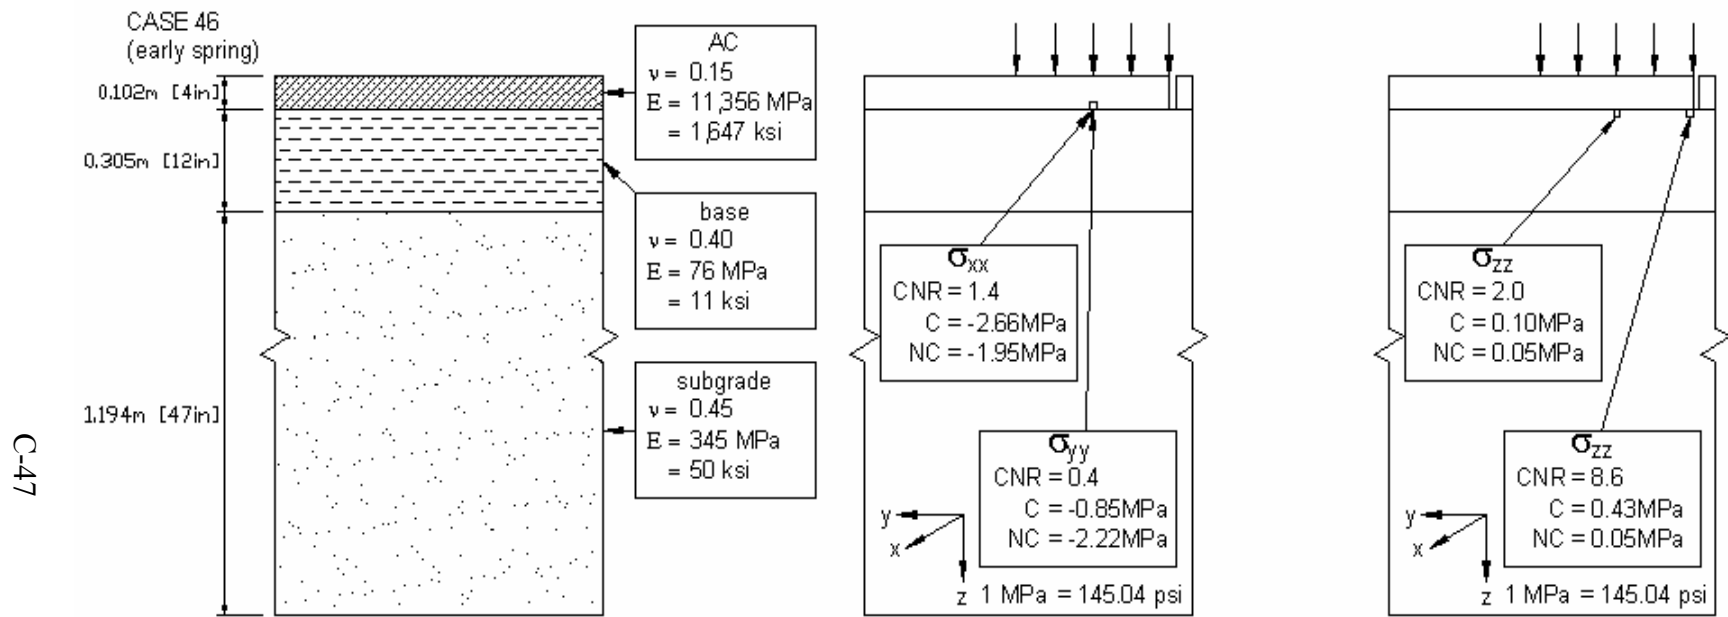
Summary cross section for case 46, (C – stress in cracked pavement, NC – stress in pavement with no crack, CNR – crack/no crack (stress) ratio)
